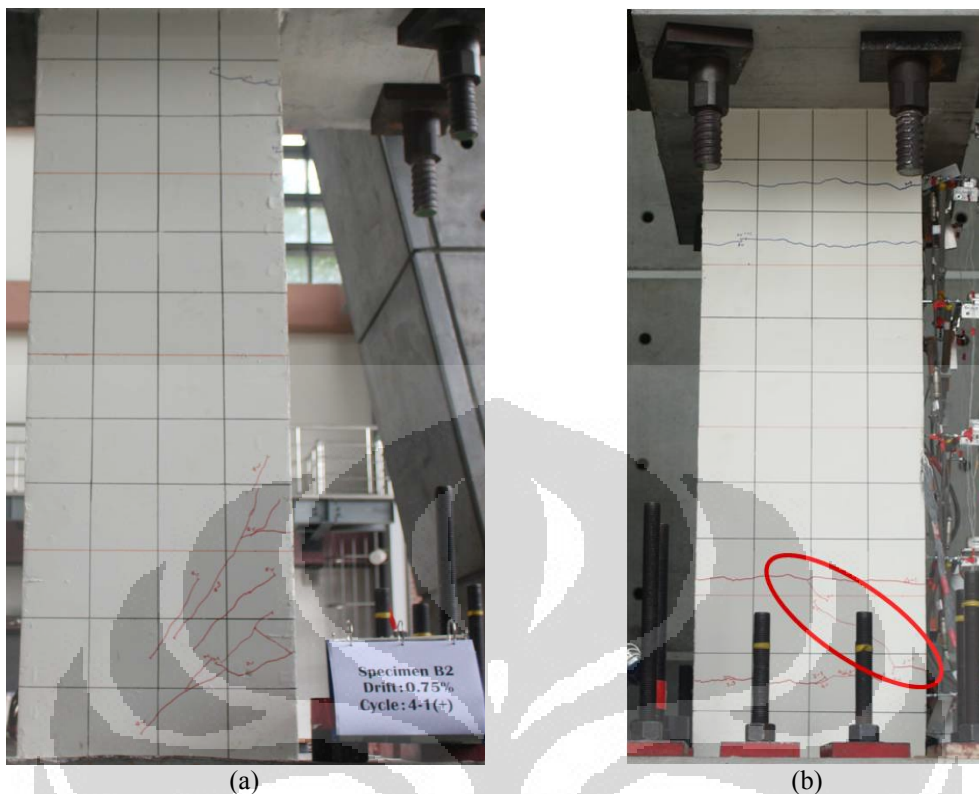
First shear crack at drift 0.75 % width crack of 0.15 mm column B2.
